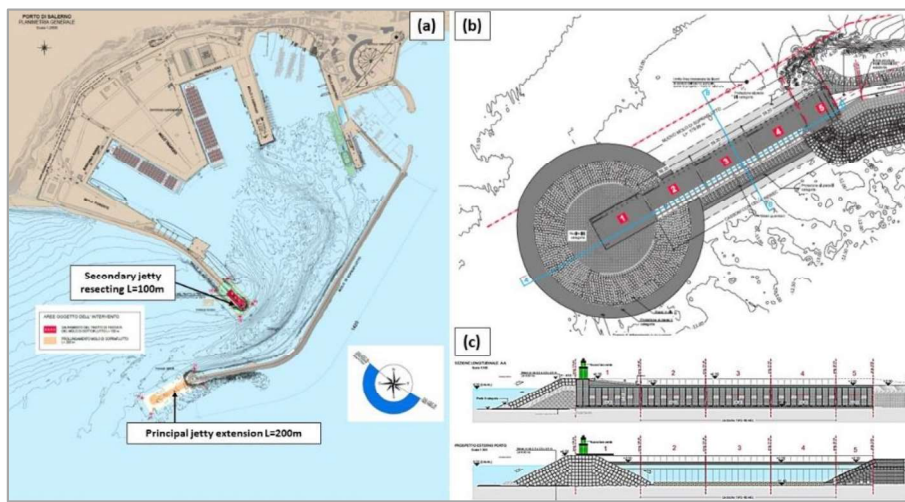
(a) General plan of interventions extracted from the final project. (b) Project layout of the main pier indicating the locations of the cellular caissons. (c) Longitudinal profile of the cellular caissons extension
